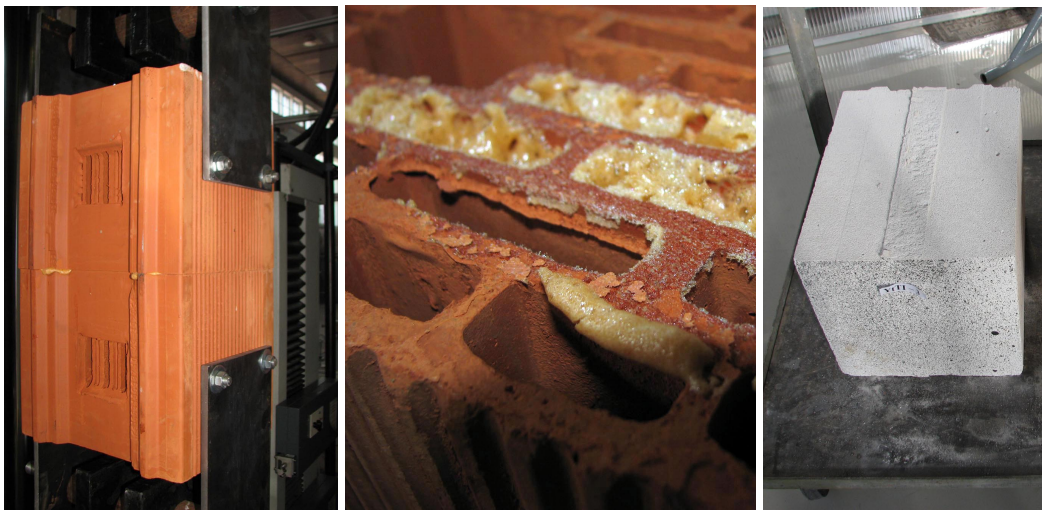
Tensile test: a) Setup; b) Failure in the PU Glue; c) Failure in Mortar
